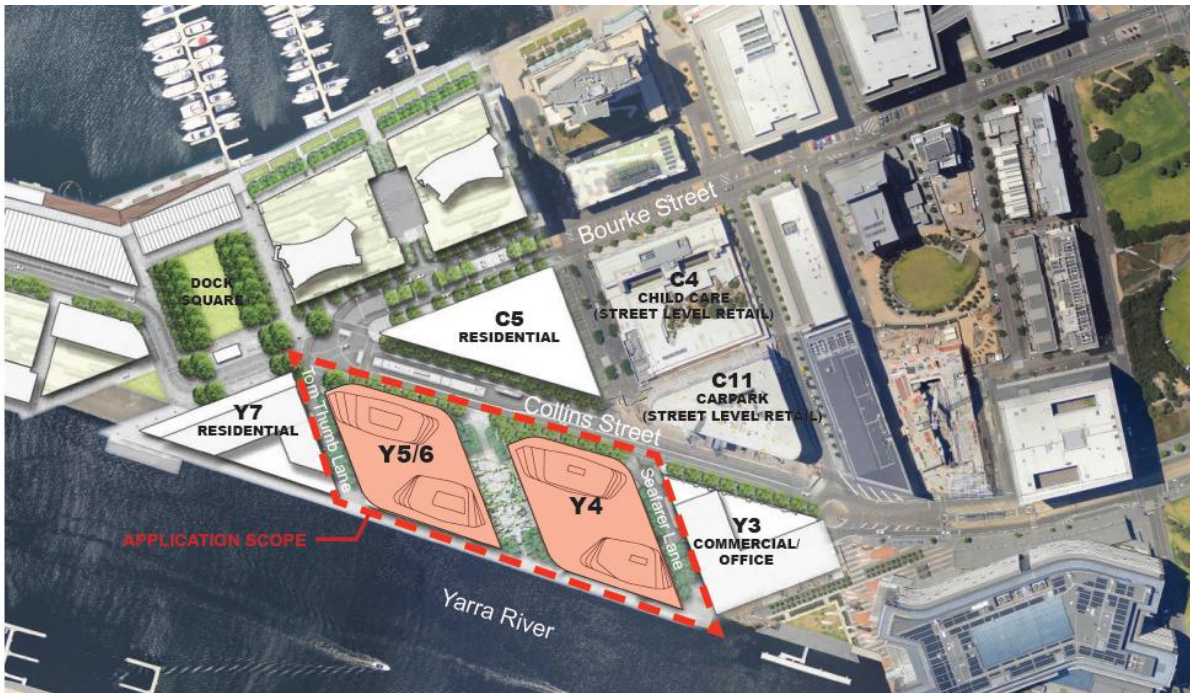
Approved Development – 839 to 889 Collins Street
